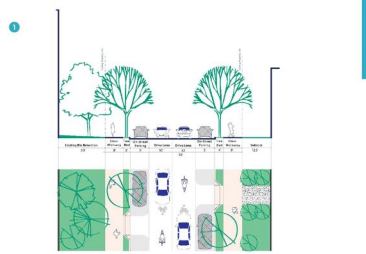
Typical Olive Avenue section between Park Boulevard and Ash Street
